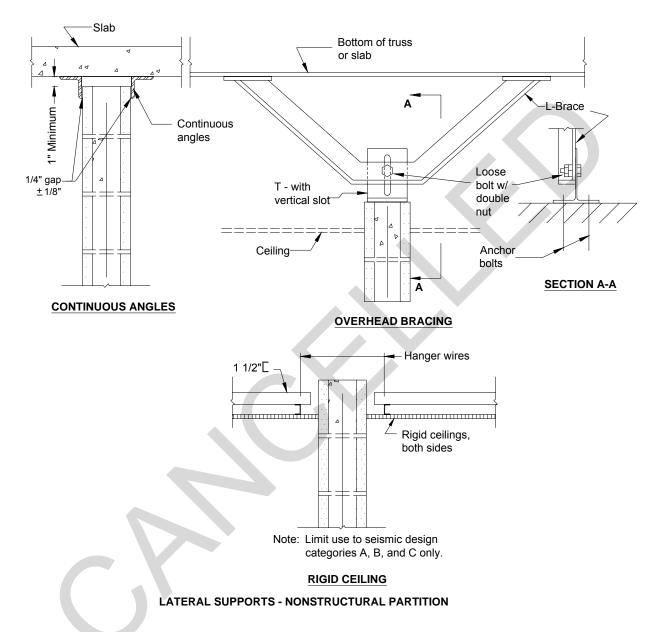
Typical Details for Isolation of Rigid Partition Walls
